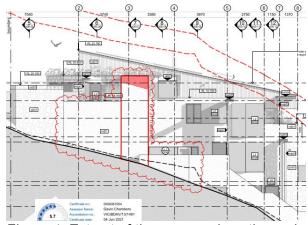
Extract of the proposed southern elevation. The extent of the building envelope non-
